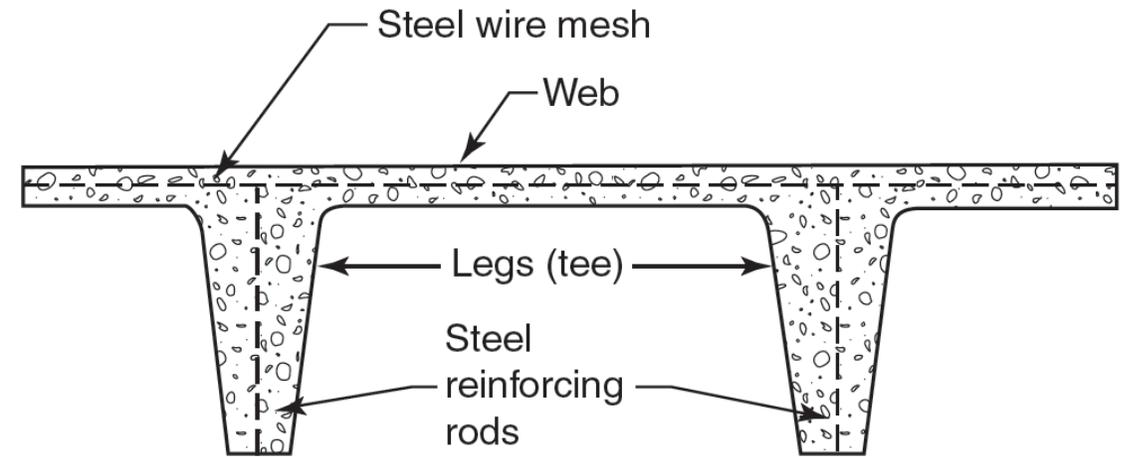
(5) Typical Concrete Joist Construction. NFPA13-2016
